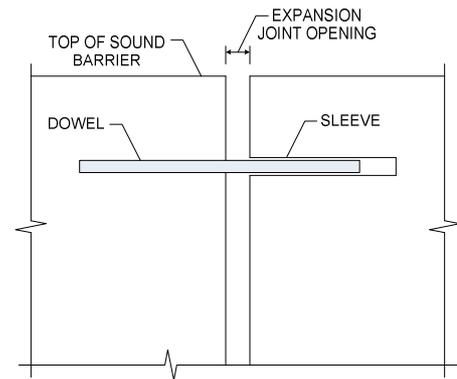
Sliding Dowel-and-Sleeve Connection
